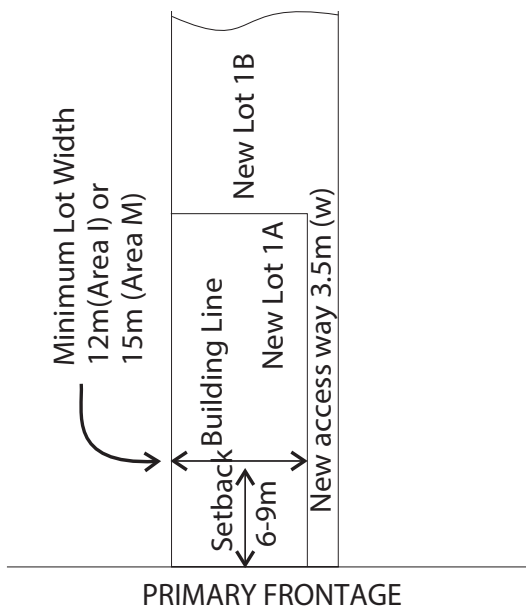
(b): Minimum lot width required at the primary street frontage boundary.(I)
